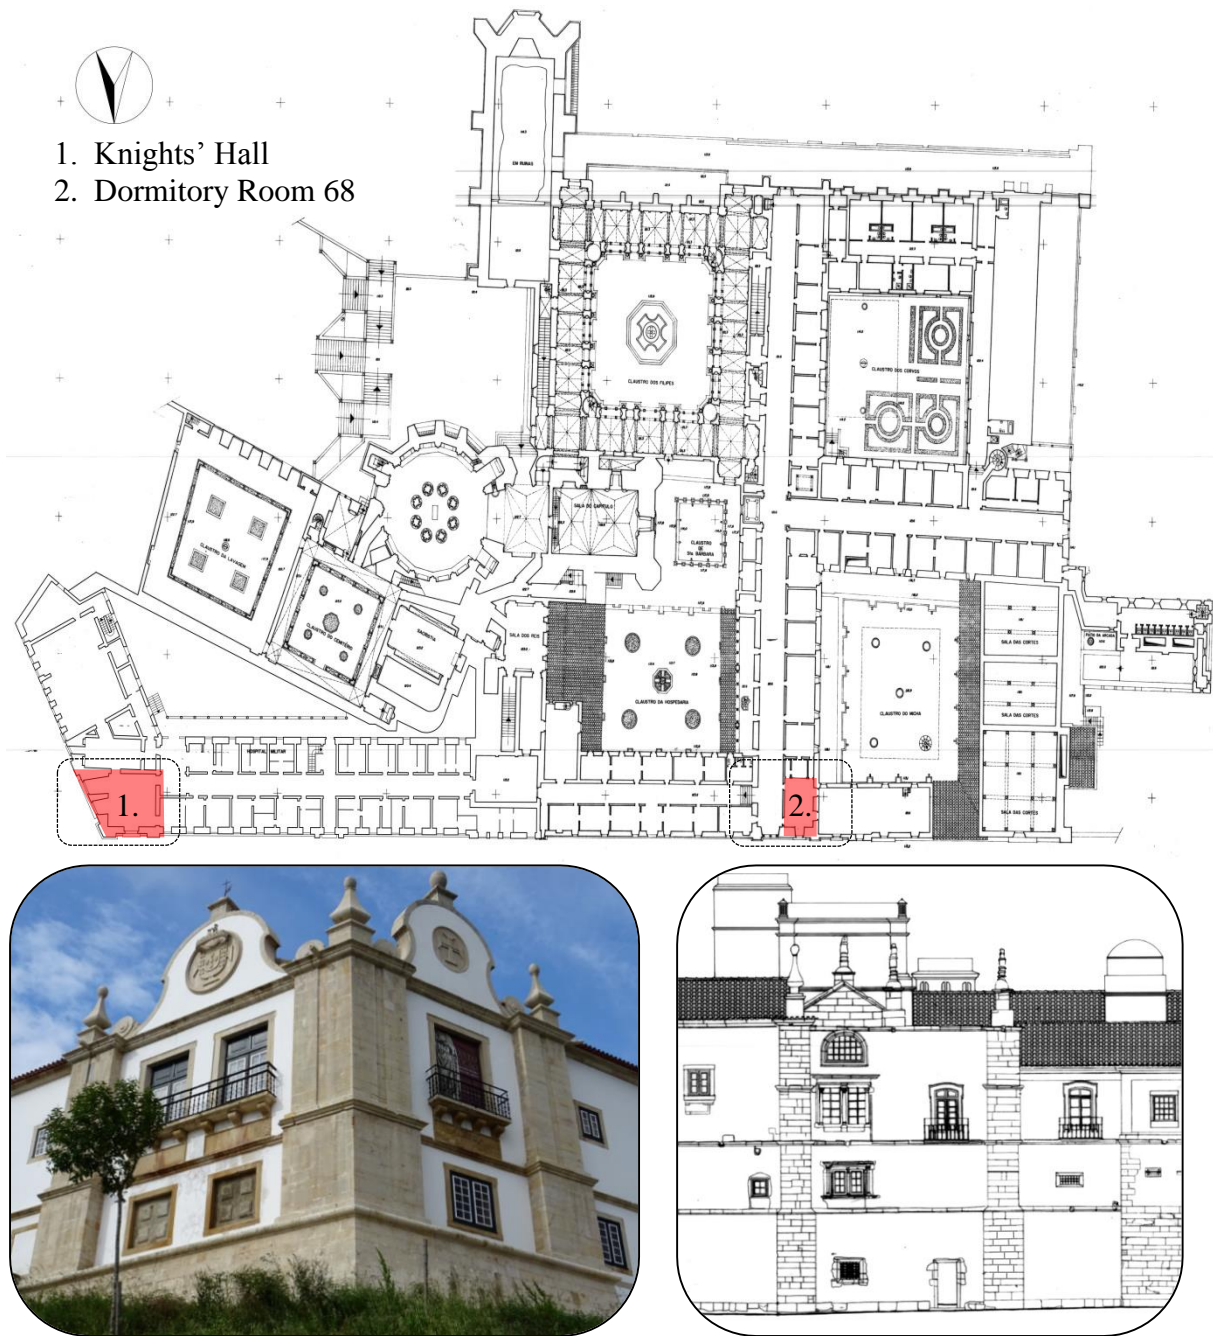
Second floor plan from the Convent of Christ in Tomar, with the location of timber roof structures under investigation (red areas).
